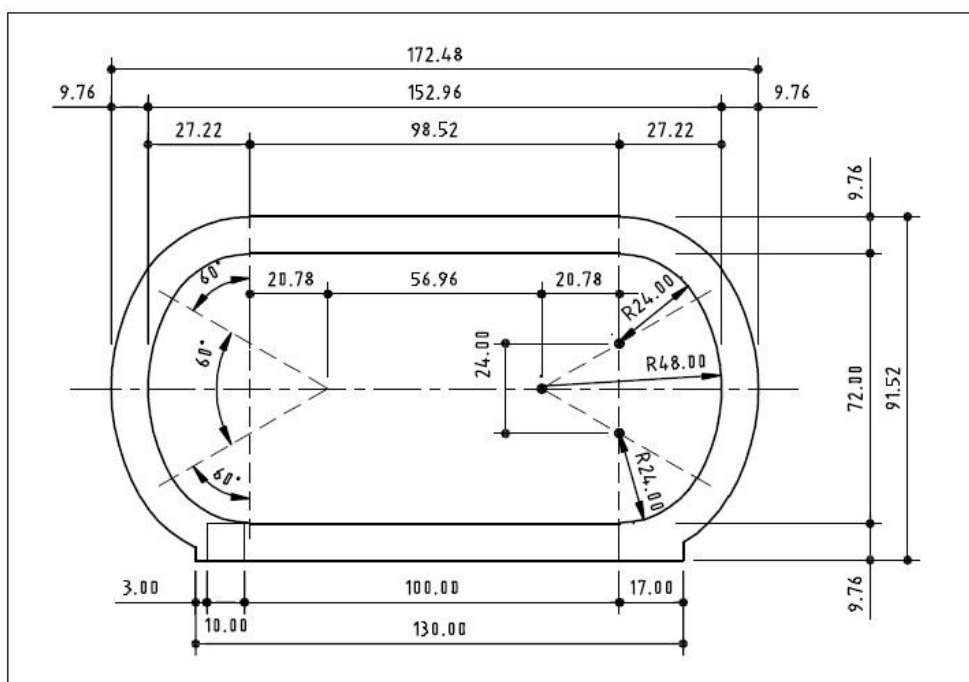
Shape and dimensions of 400m Double Bend Track (Radii 48m and 24m)
